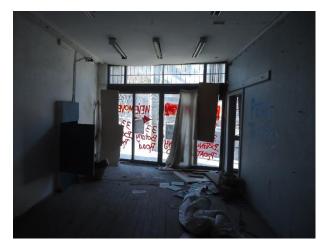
Ground floor of no. 80 facing east Source: Urbis, 2018
